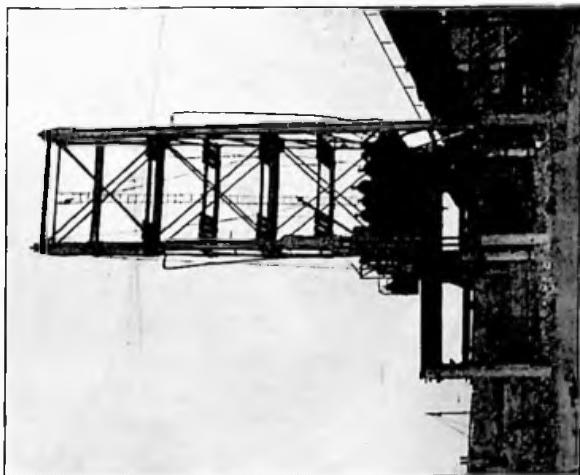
Duplex Pile-Driving Frame on Scar End of Works, Shellhaven.
